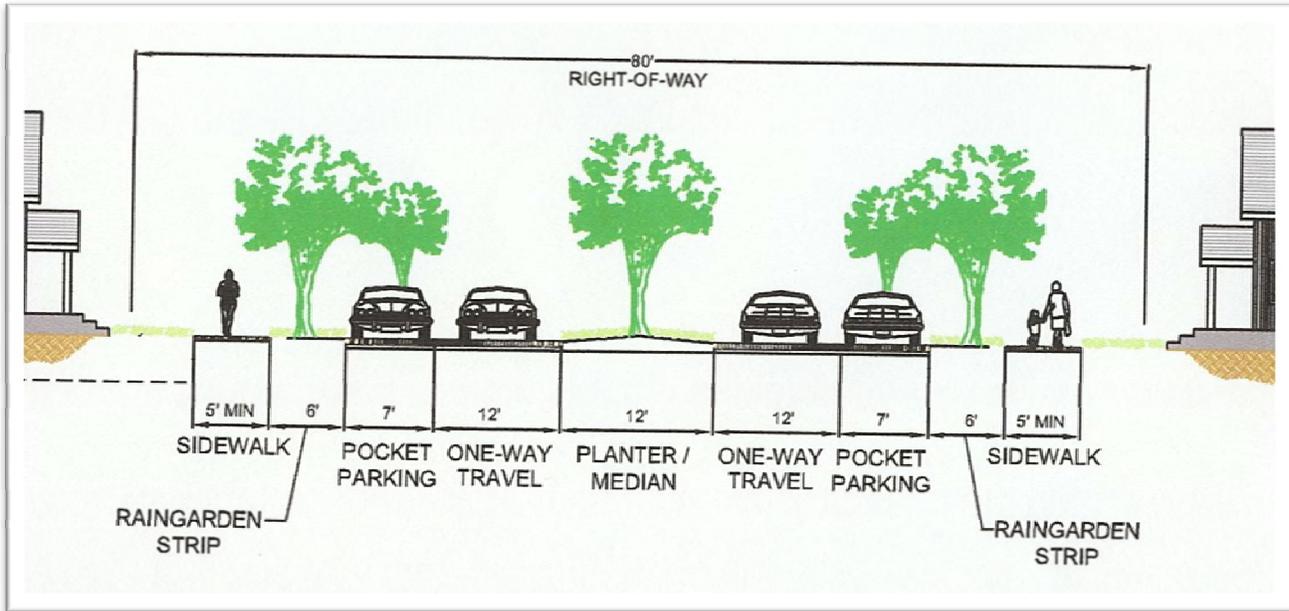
Example of “parkway” with narrow travel lanes and pocket parking with sidewalk separated by raingarden/bioretention strip for appeal, safety and stormwater sheet flow to facility.
